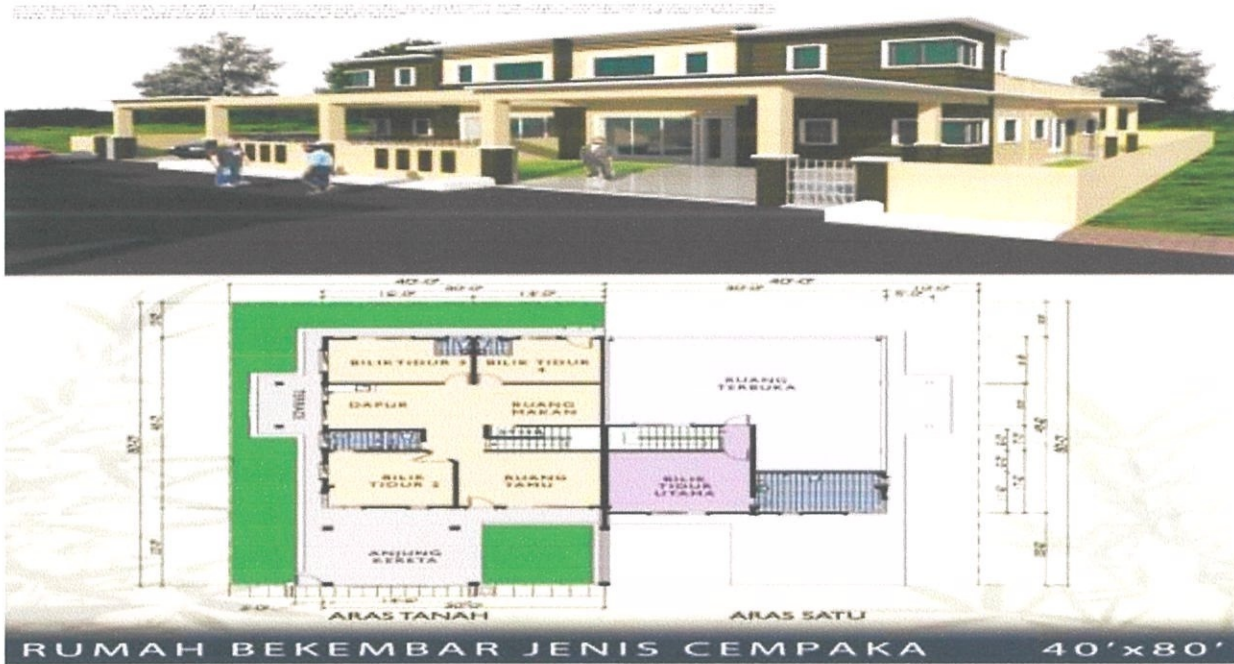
Double storey house, Panchang Bedena Sabak Bernam
